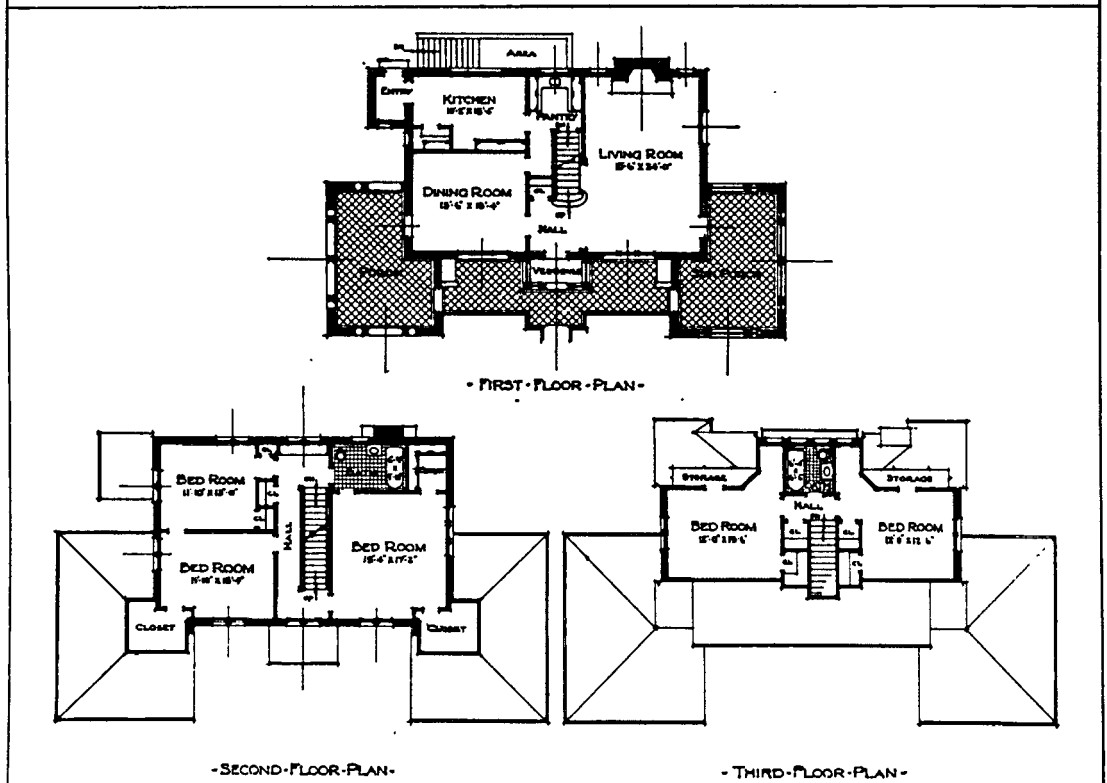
William J. Leonard House "House I-F-237." Ascan Avenue and Russell Place. Albro & Lindeberg, Architects.
